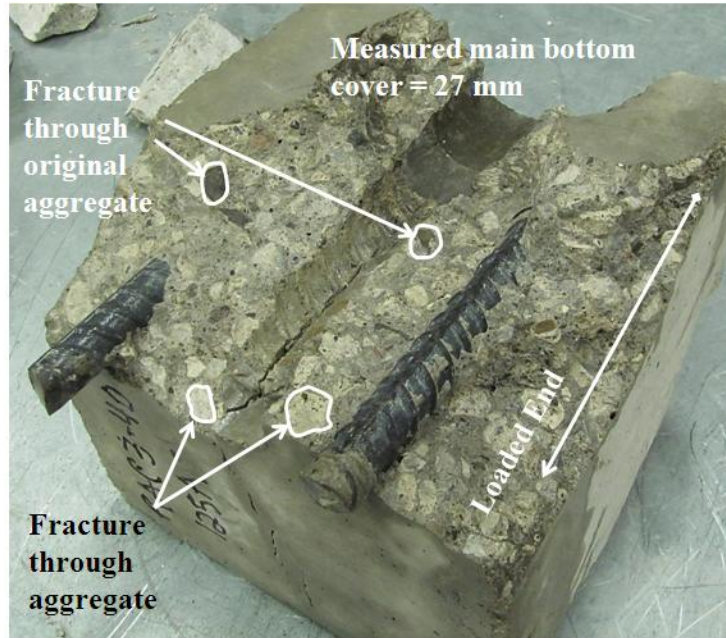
Main failure planes through concrete cover (dissected BE-RAC3-40-125A)
